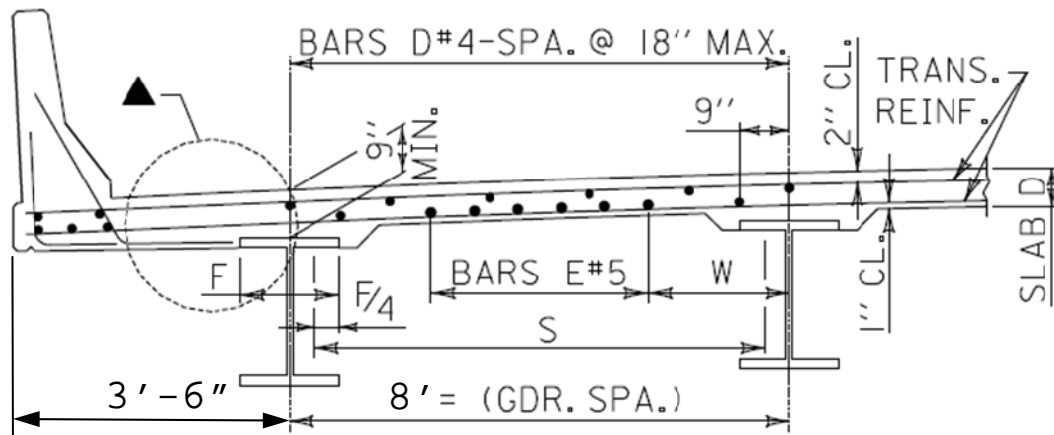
Standard ALDOT Steel Girder Bridge Geometry (Alabama Department of Transportation 2008)
